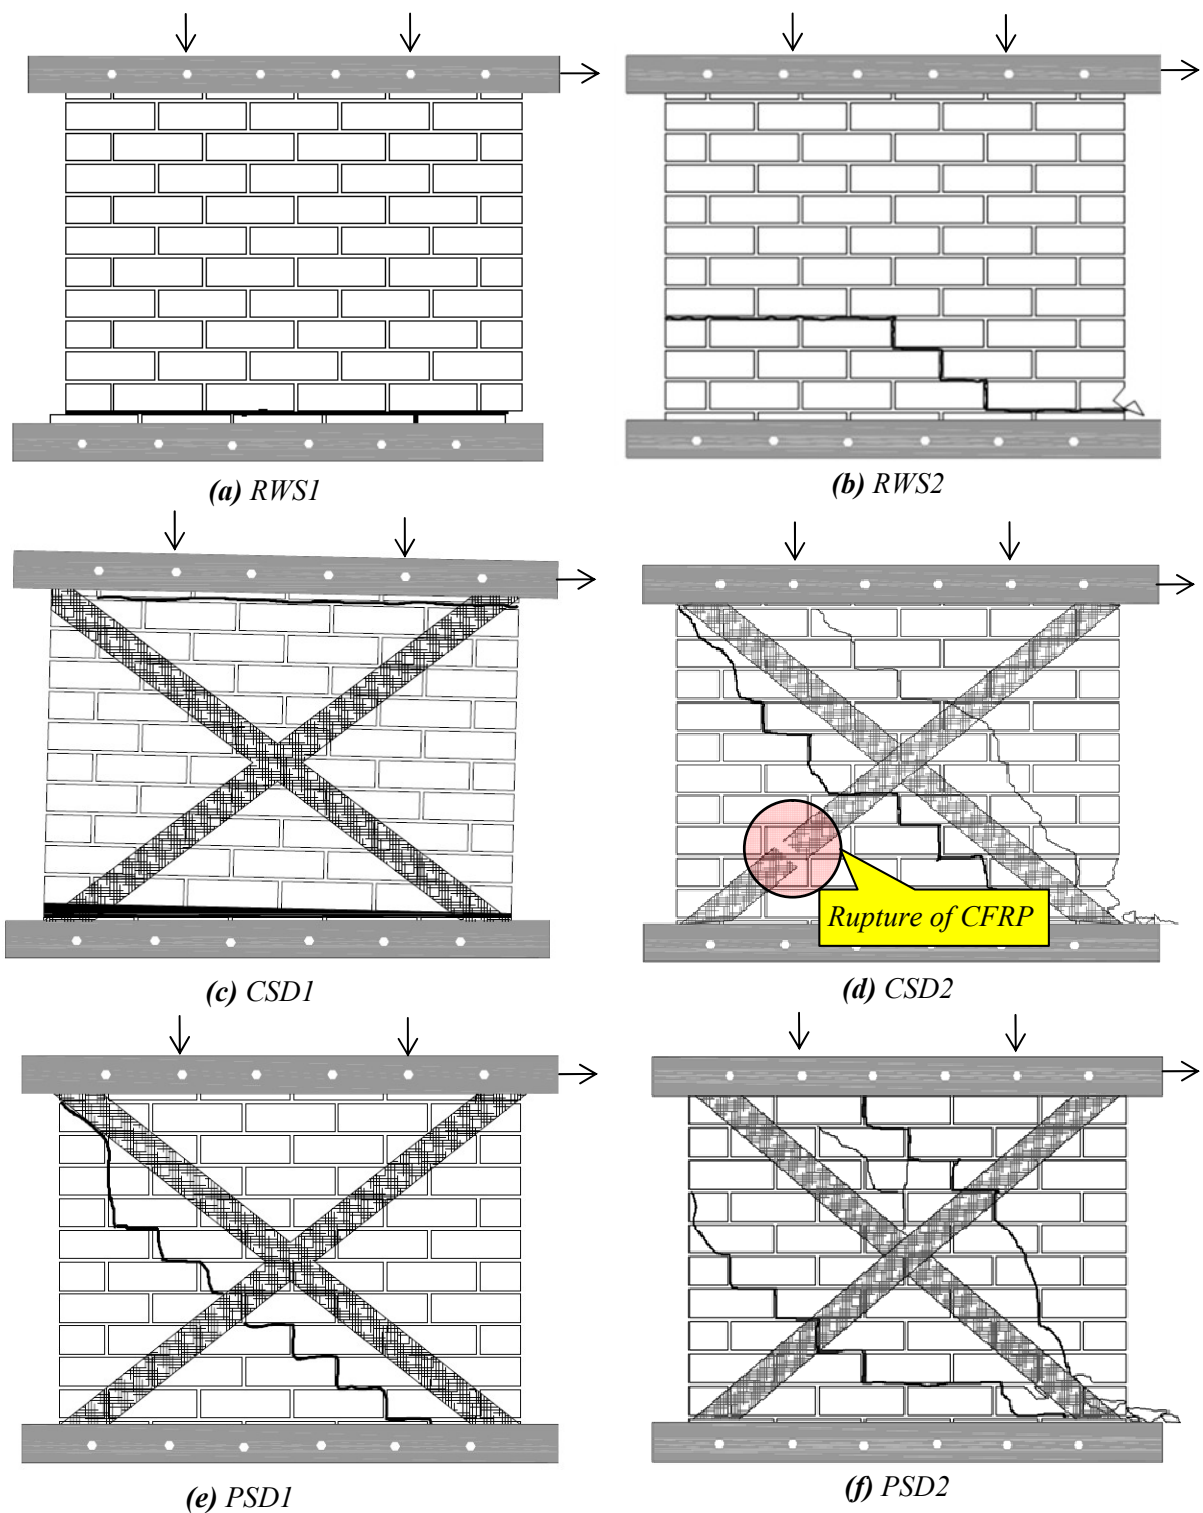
Schematic illustration of crack patterns in URM and diagonally strengthened masonry walls
